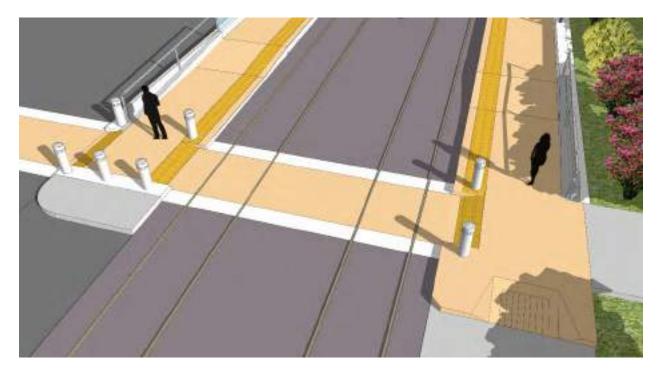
Crossing Treatment, Typical Side-Loading Platform Stop Between Landscape Area and Roadway
